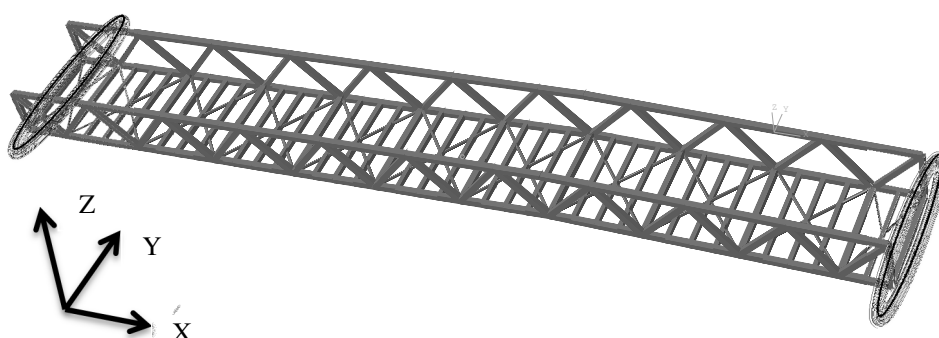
FE model of the steel truss bridge. The end beams where the steel deck is attached are highlighted.
